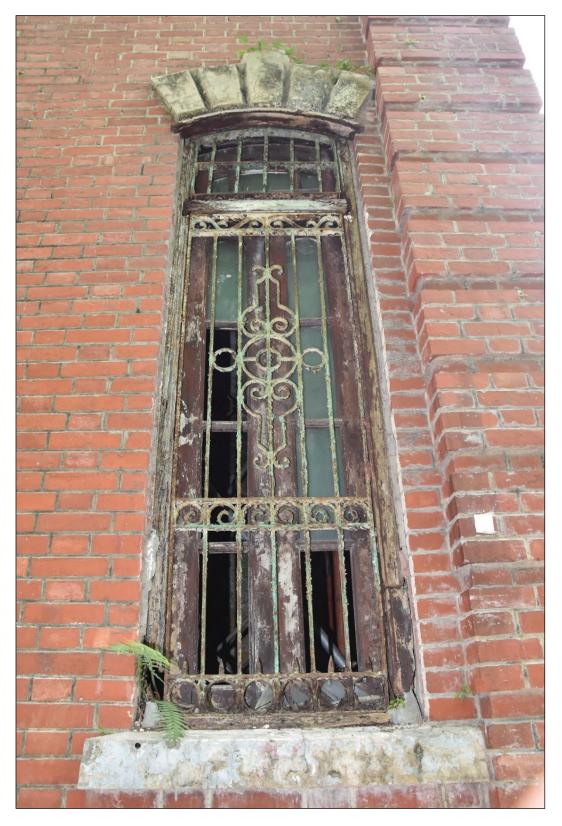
South-east elevation (facing Ship Street), ground floor, window Wdw-f05, (21st March, 2023)
